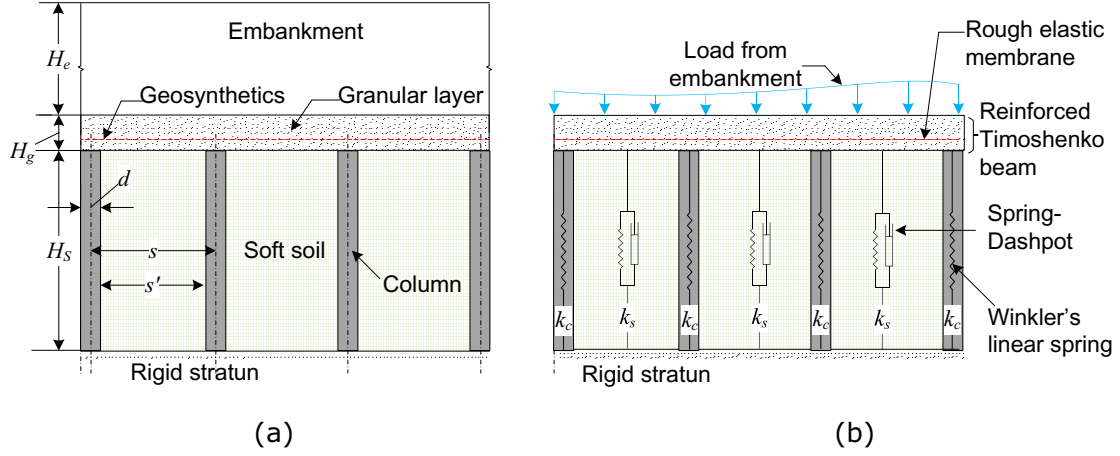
Illustration of: (a) embankment on CIC-improved soft soil and (b) proposed foundation model.
